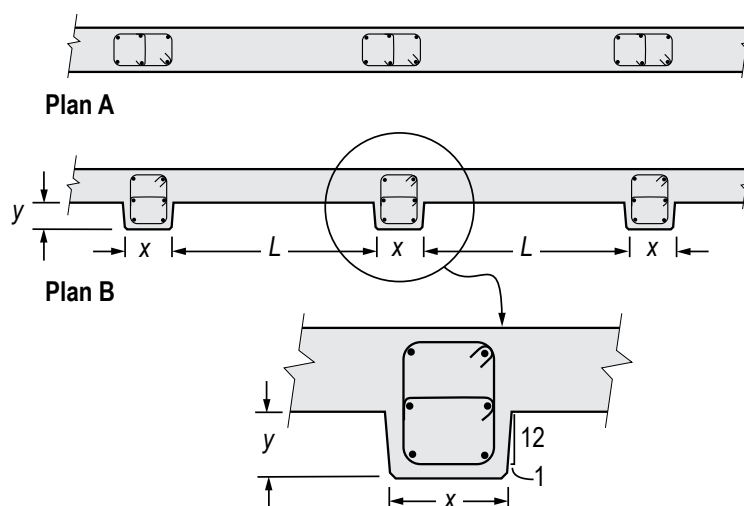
Pilasters increase the complexity of wall formwork, thus diminishing construction productivity. In the preferred alternative (Plan A), pilaster reinforcement is contained within a wall and the wall formwork has a planar surface. If pilasters must extend beyond one face of a wall (Plan B), the construction documents should provide a simple detail or note allowing the contractor to provide draft. (Image courtesy of Ceco Concrete Construction.) Another constructable pilaster design alternative is increasing the pilaster reinforcing tie size and spacing to allow shotcrete to be used. Refer to Fig. 2.12.10. (Image courtesy of Conco.)
